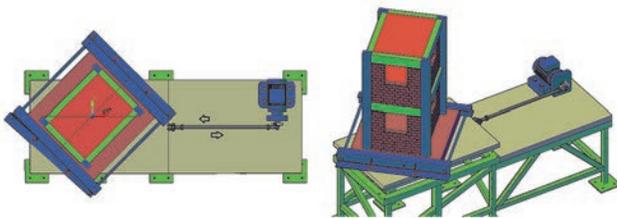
3D and plan view of Specimen 3 (angle: 45°)
